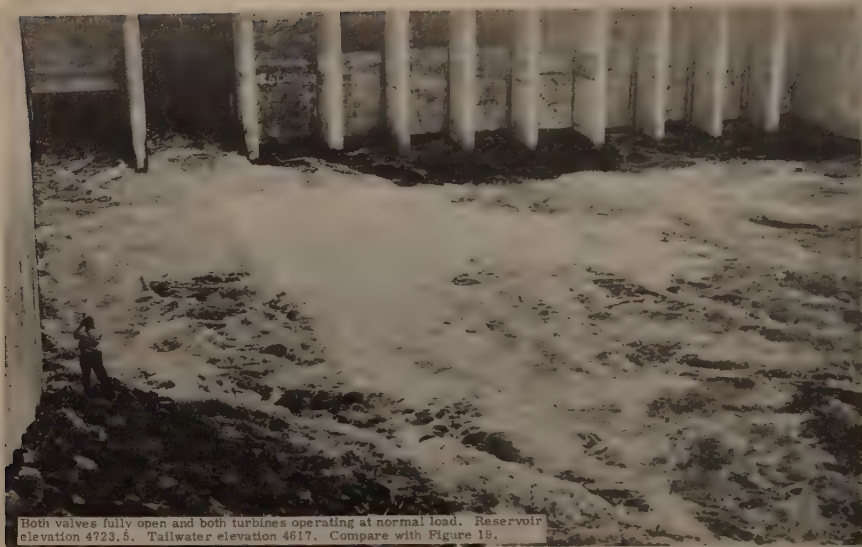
BOYSEN DAM OUTLET WORKS DISCHARGING 1344 CFS
